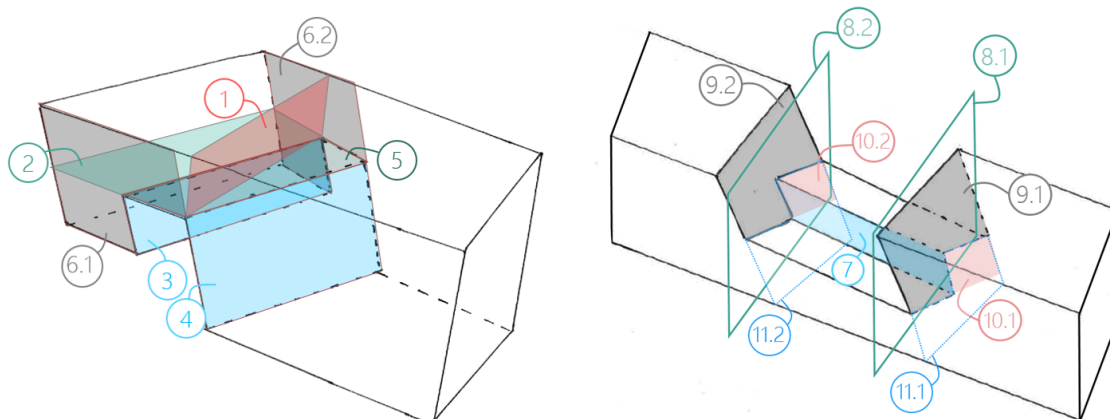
Relevant planes for beam 1 (left) and beam 2 (right)
